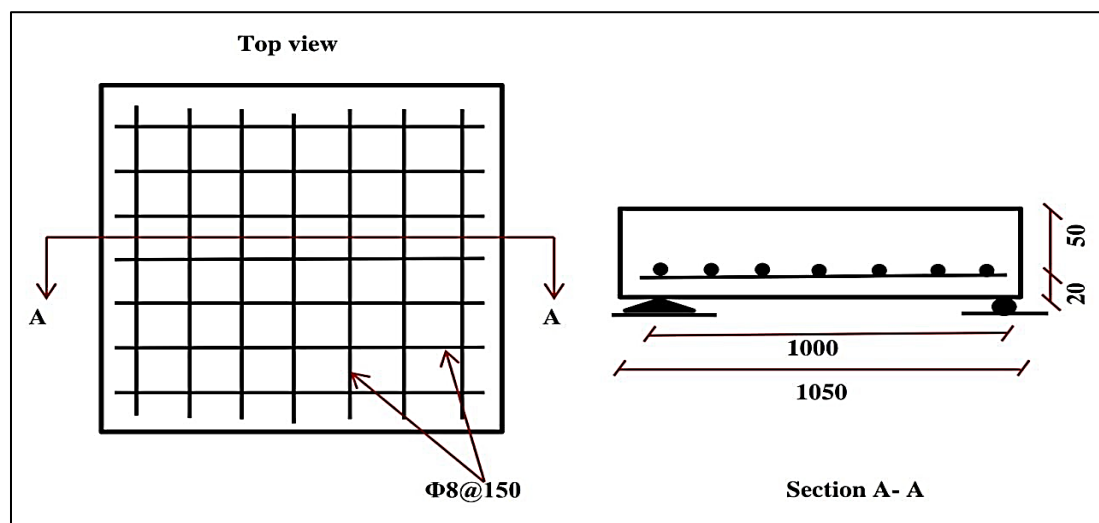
Slab geometry and reinforcement details, all dimensions in mm.
